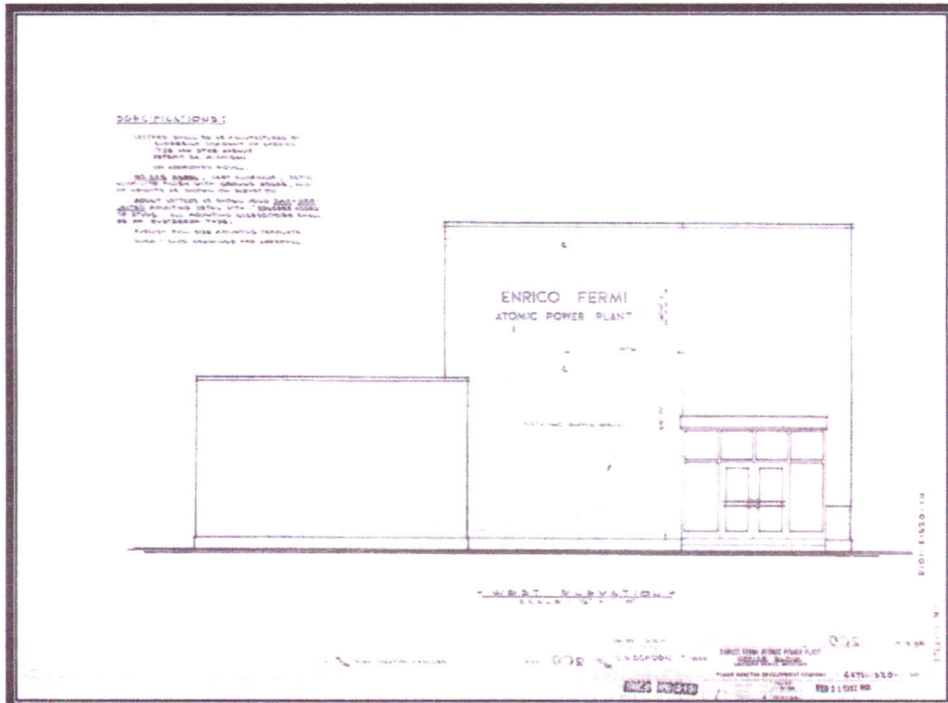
Elevation of west wall of office building (Courtesy DECo)
